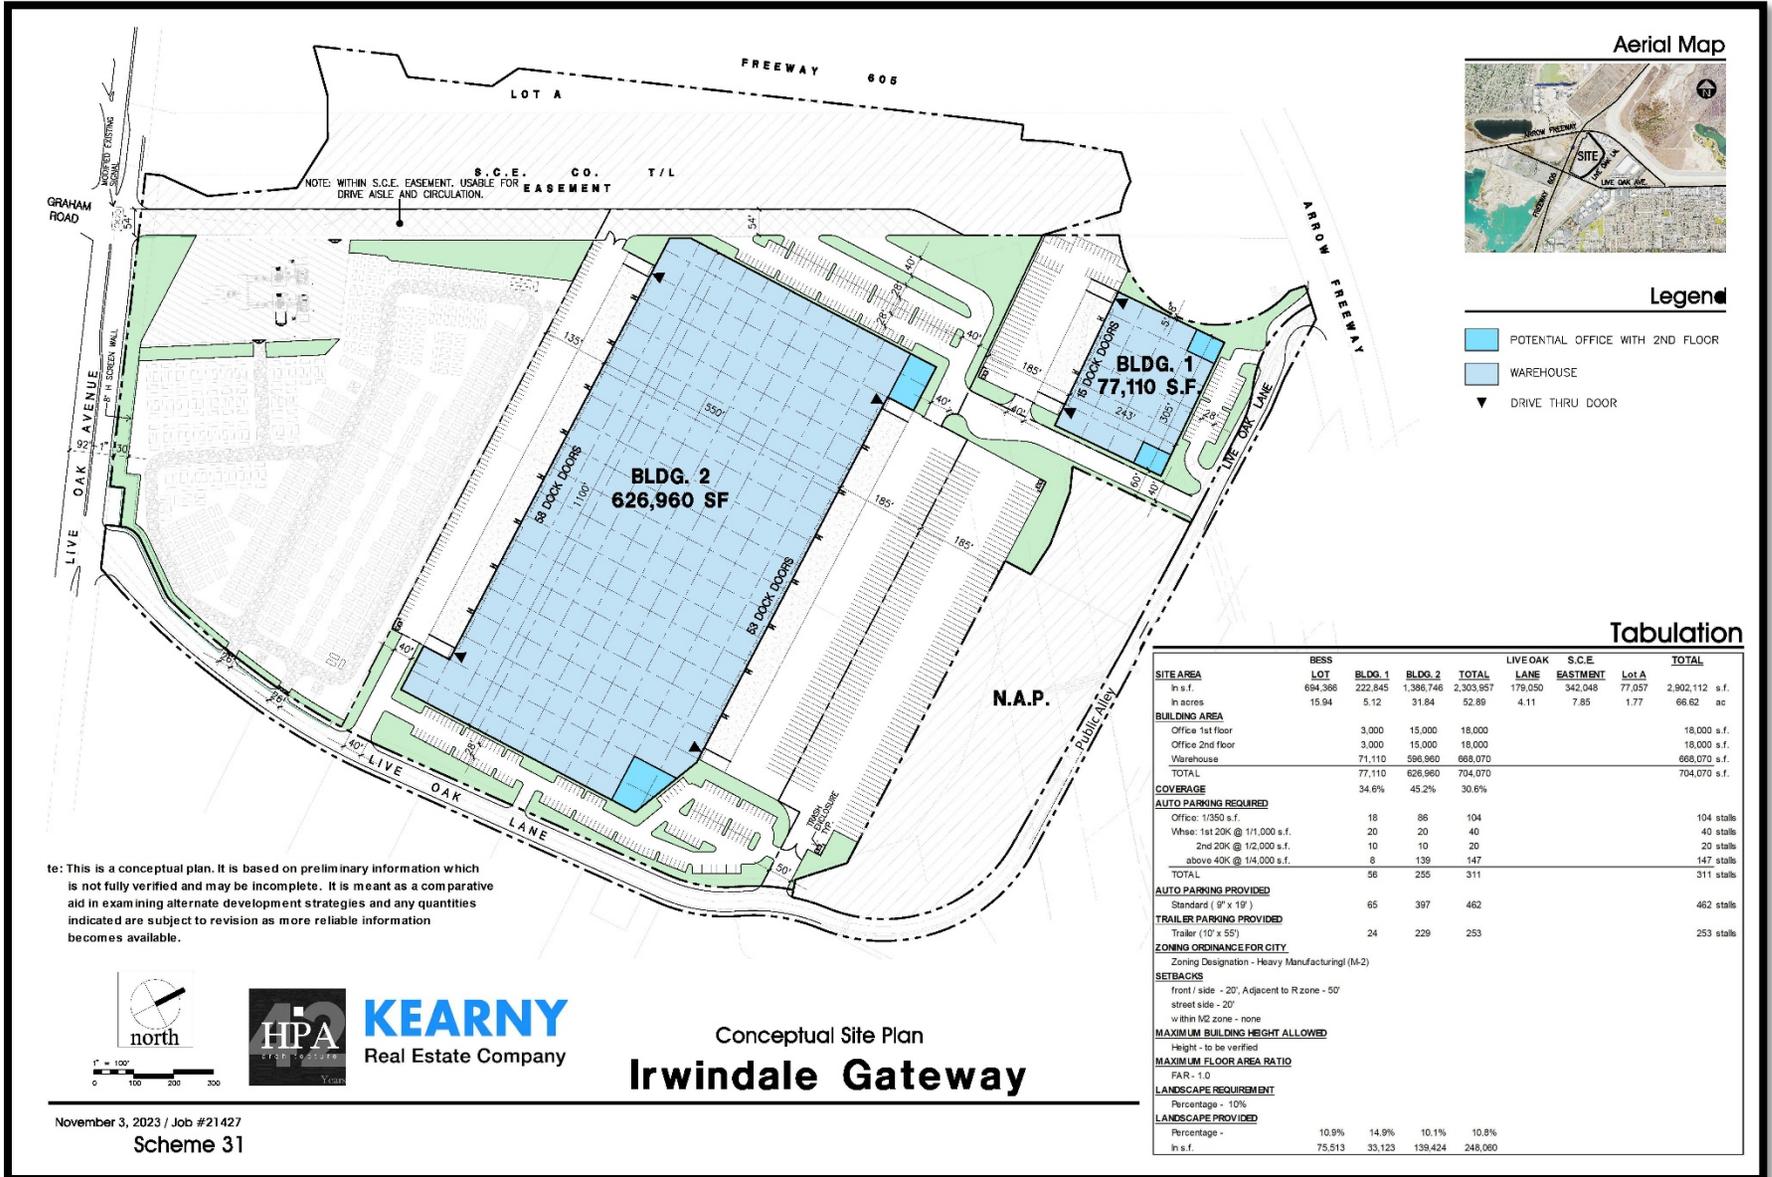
CONCEPTUAL SITE PLAN WITH BESS
